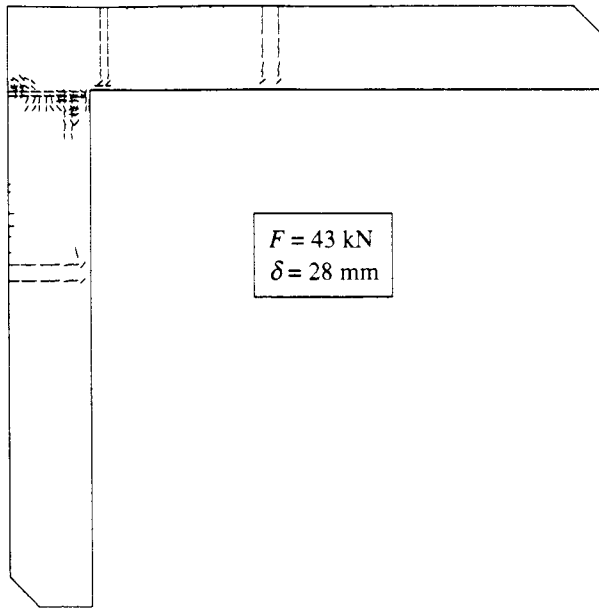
Crack pattern at the end of the analysis for a frame corner with the new reinforcement detailing when assuming "bad" bond condition.
